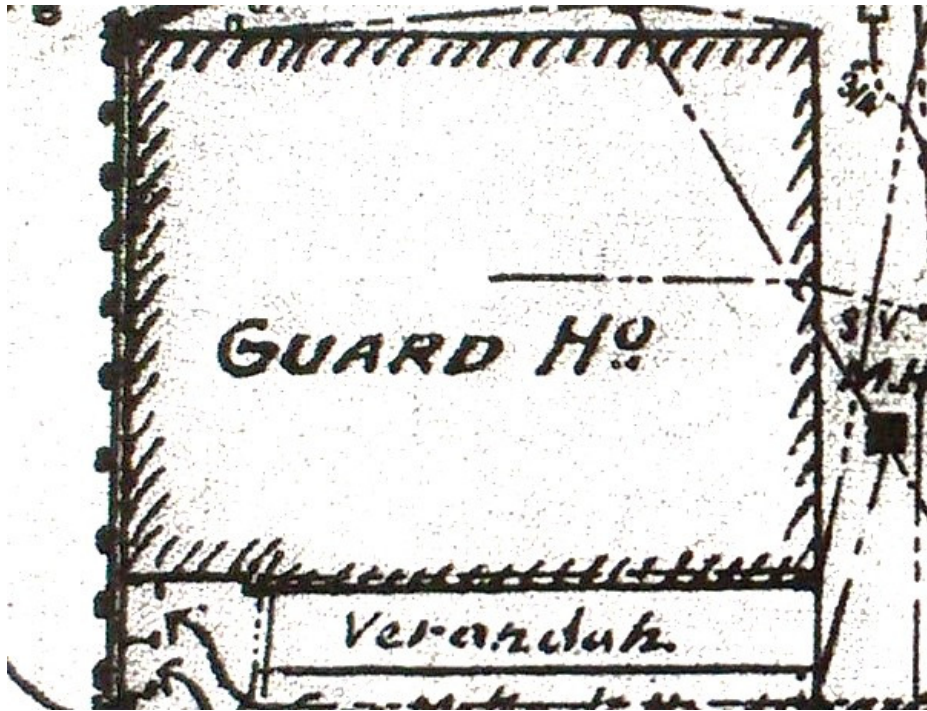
Extract from 1910 plan showing the original function and layout of MEE 03 (EHA 95/1579).
